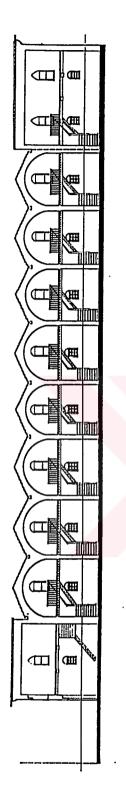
North East Wing, North East Wall. Interior (Restitution)
